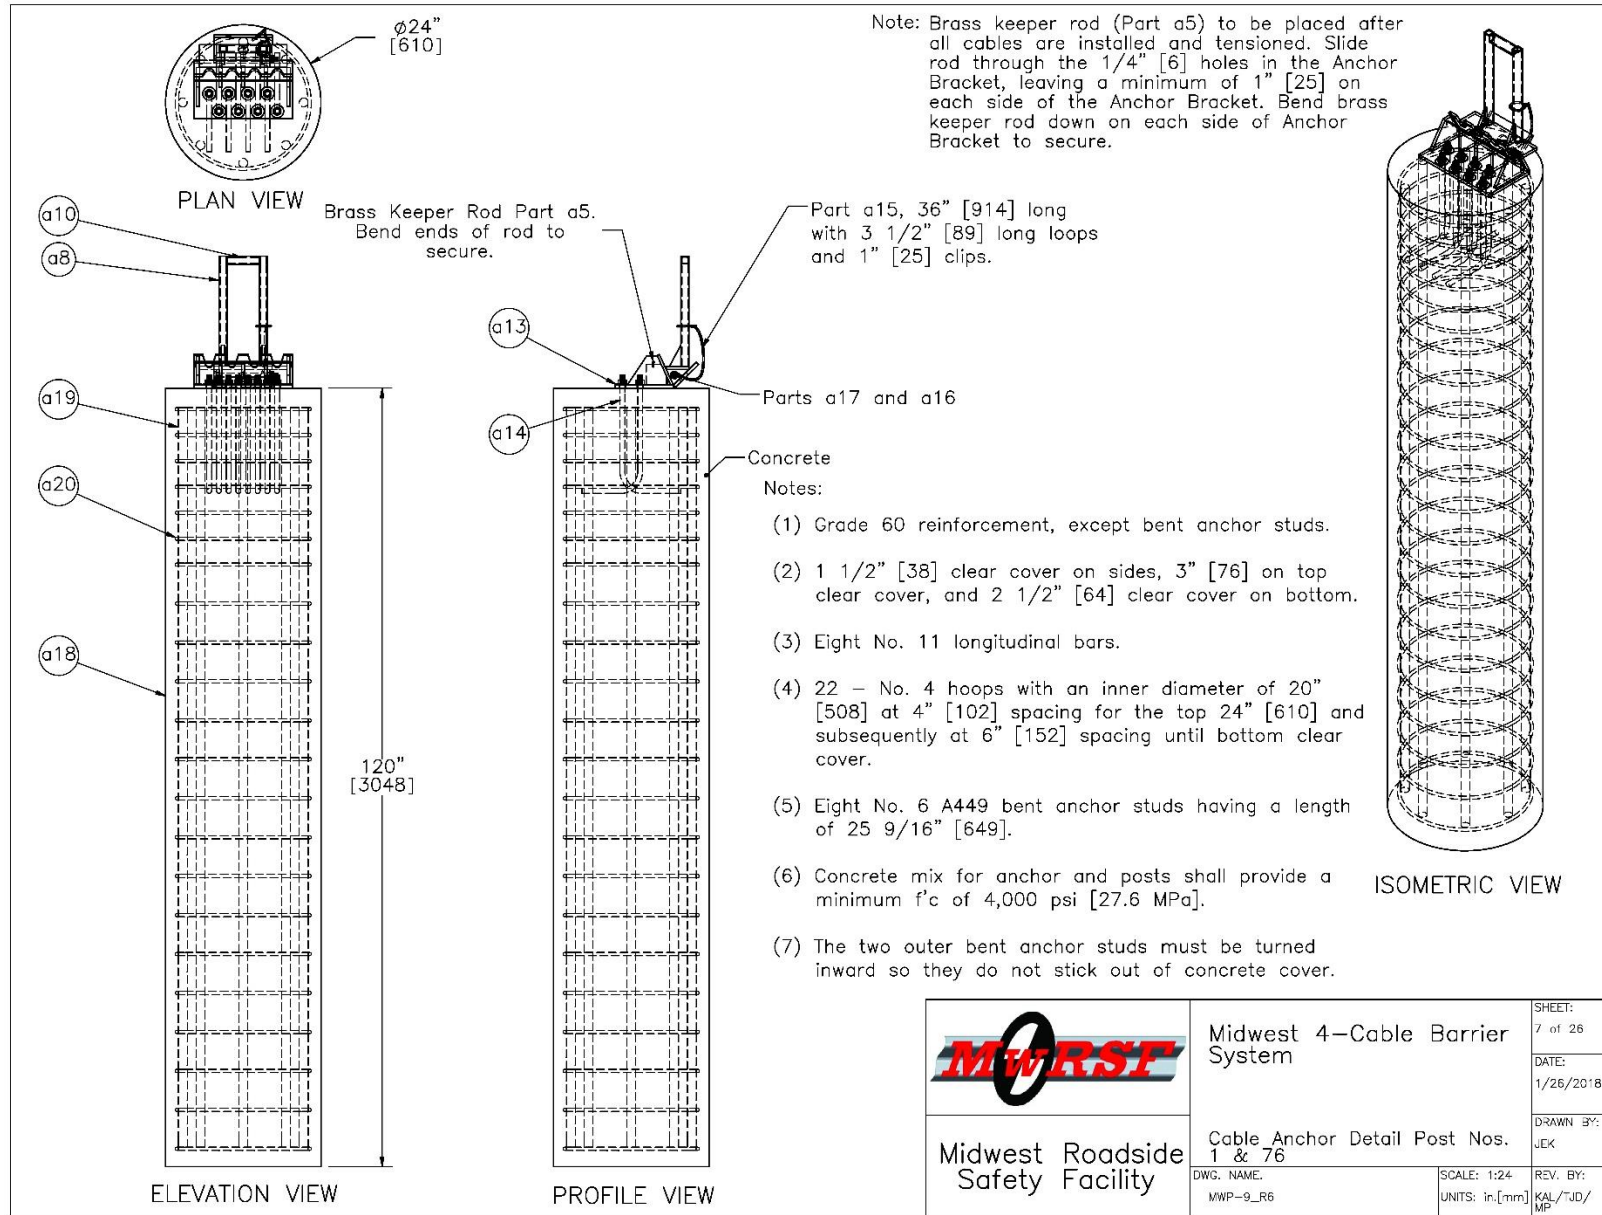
Cable Anchor Detail, Post Nos. 1 and 76, Test No. MWP-9
